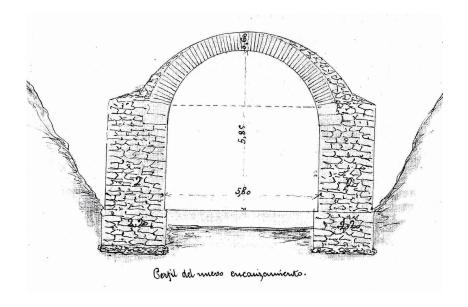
Section of the plan for building at Rastro area. (Municipal Archive)
